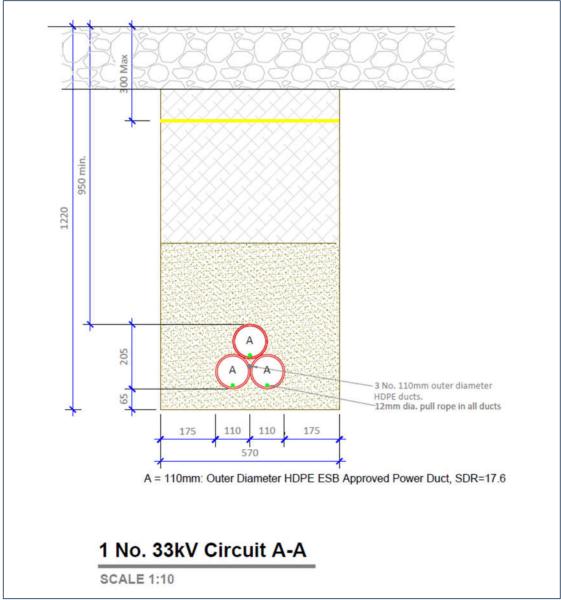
Section Through Forestry/Wind Farm Site Road
